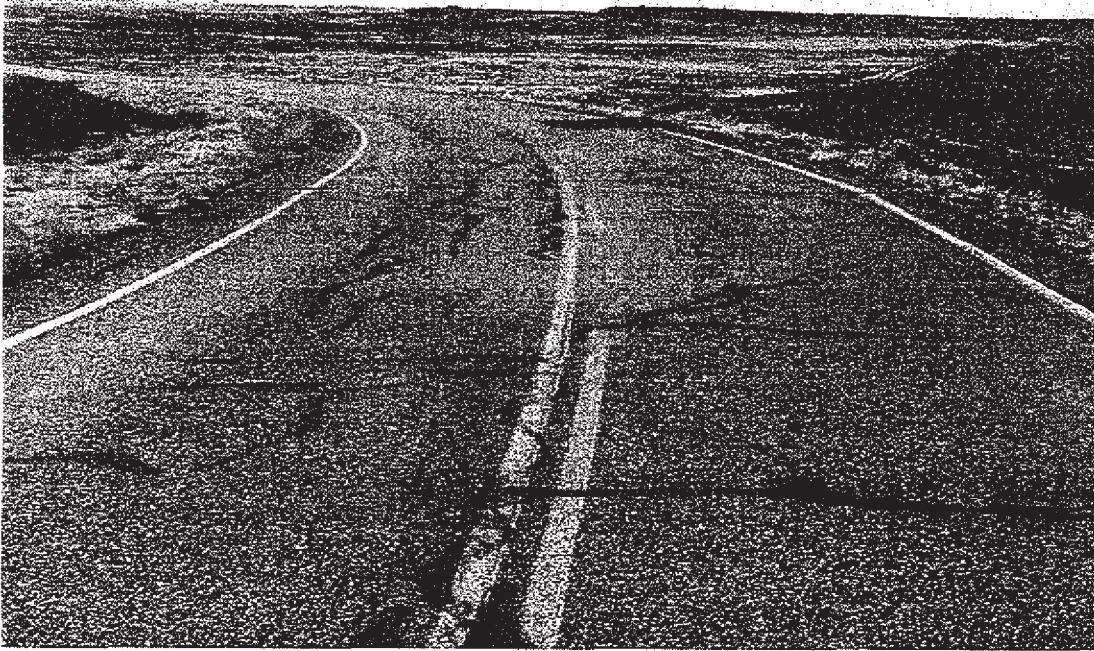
MP 25.40 - Typical Pavement Section, Note Longitudinal and Transverse Sealed Cracks
